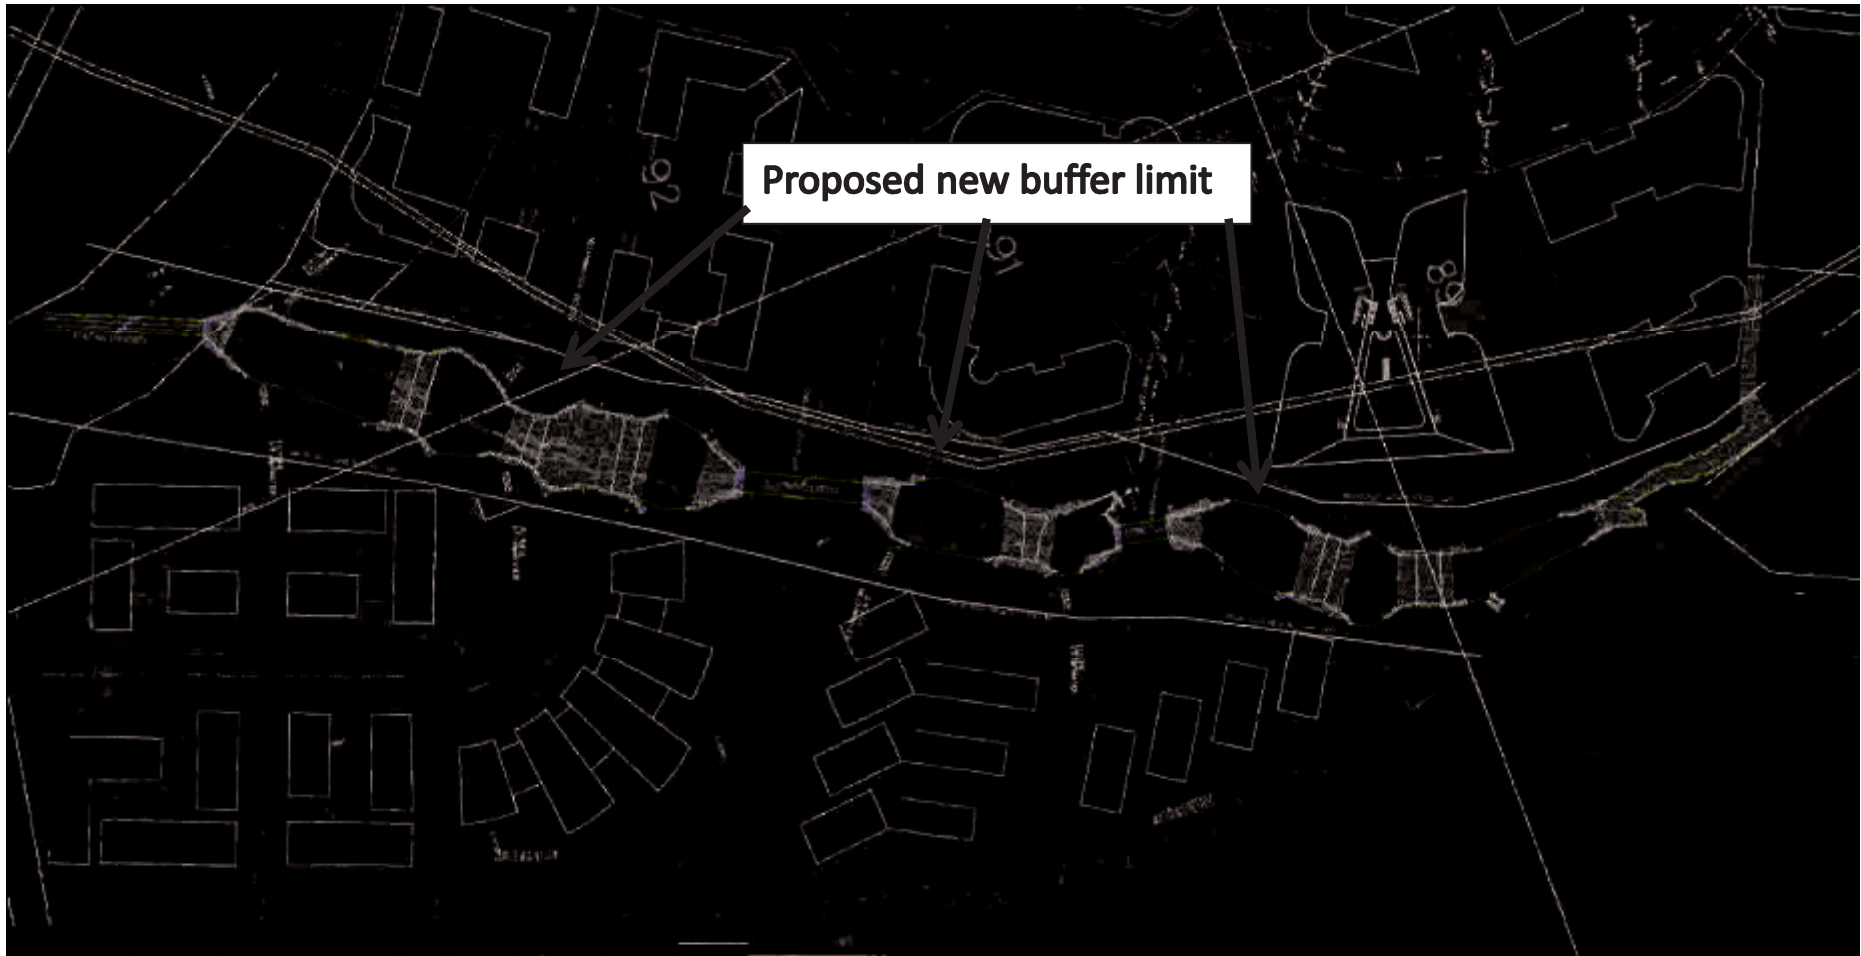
Previously approved layout plan including the rehabilitated wetland area and approved storm water layout.
